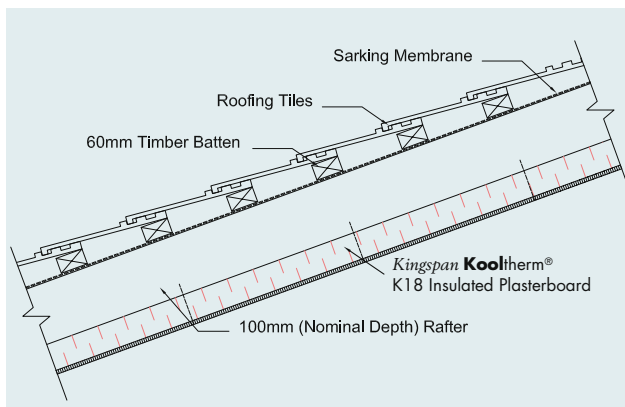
Side elevation - Raked ceiling with *Kingspan Kooltherm*[®] K18 Insulated Plasterboard
